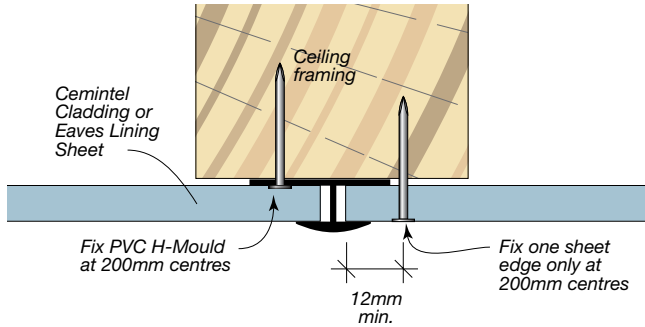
Edge Joint with PVC H-Mould – Ceiling
